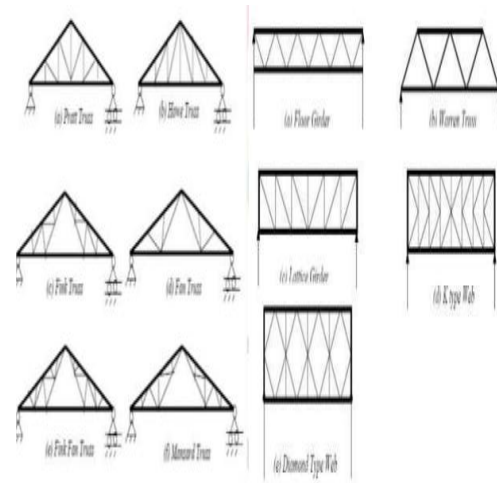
Pitched roof trusses Figure 1.2 Parallel chord trusses
